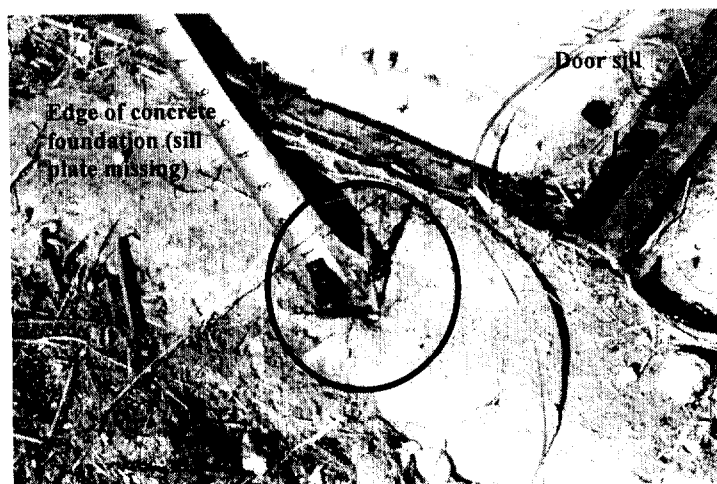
Evidence of nail that was used for connecting sill plate to concrete foundation.
